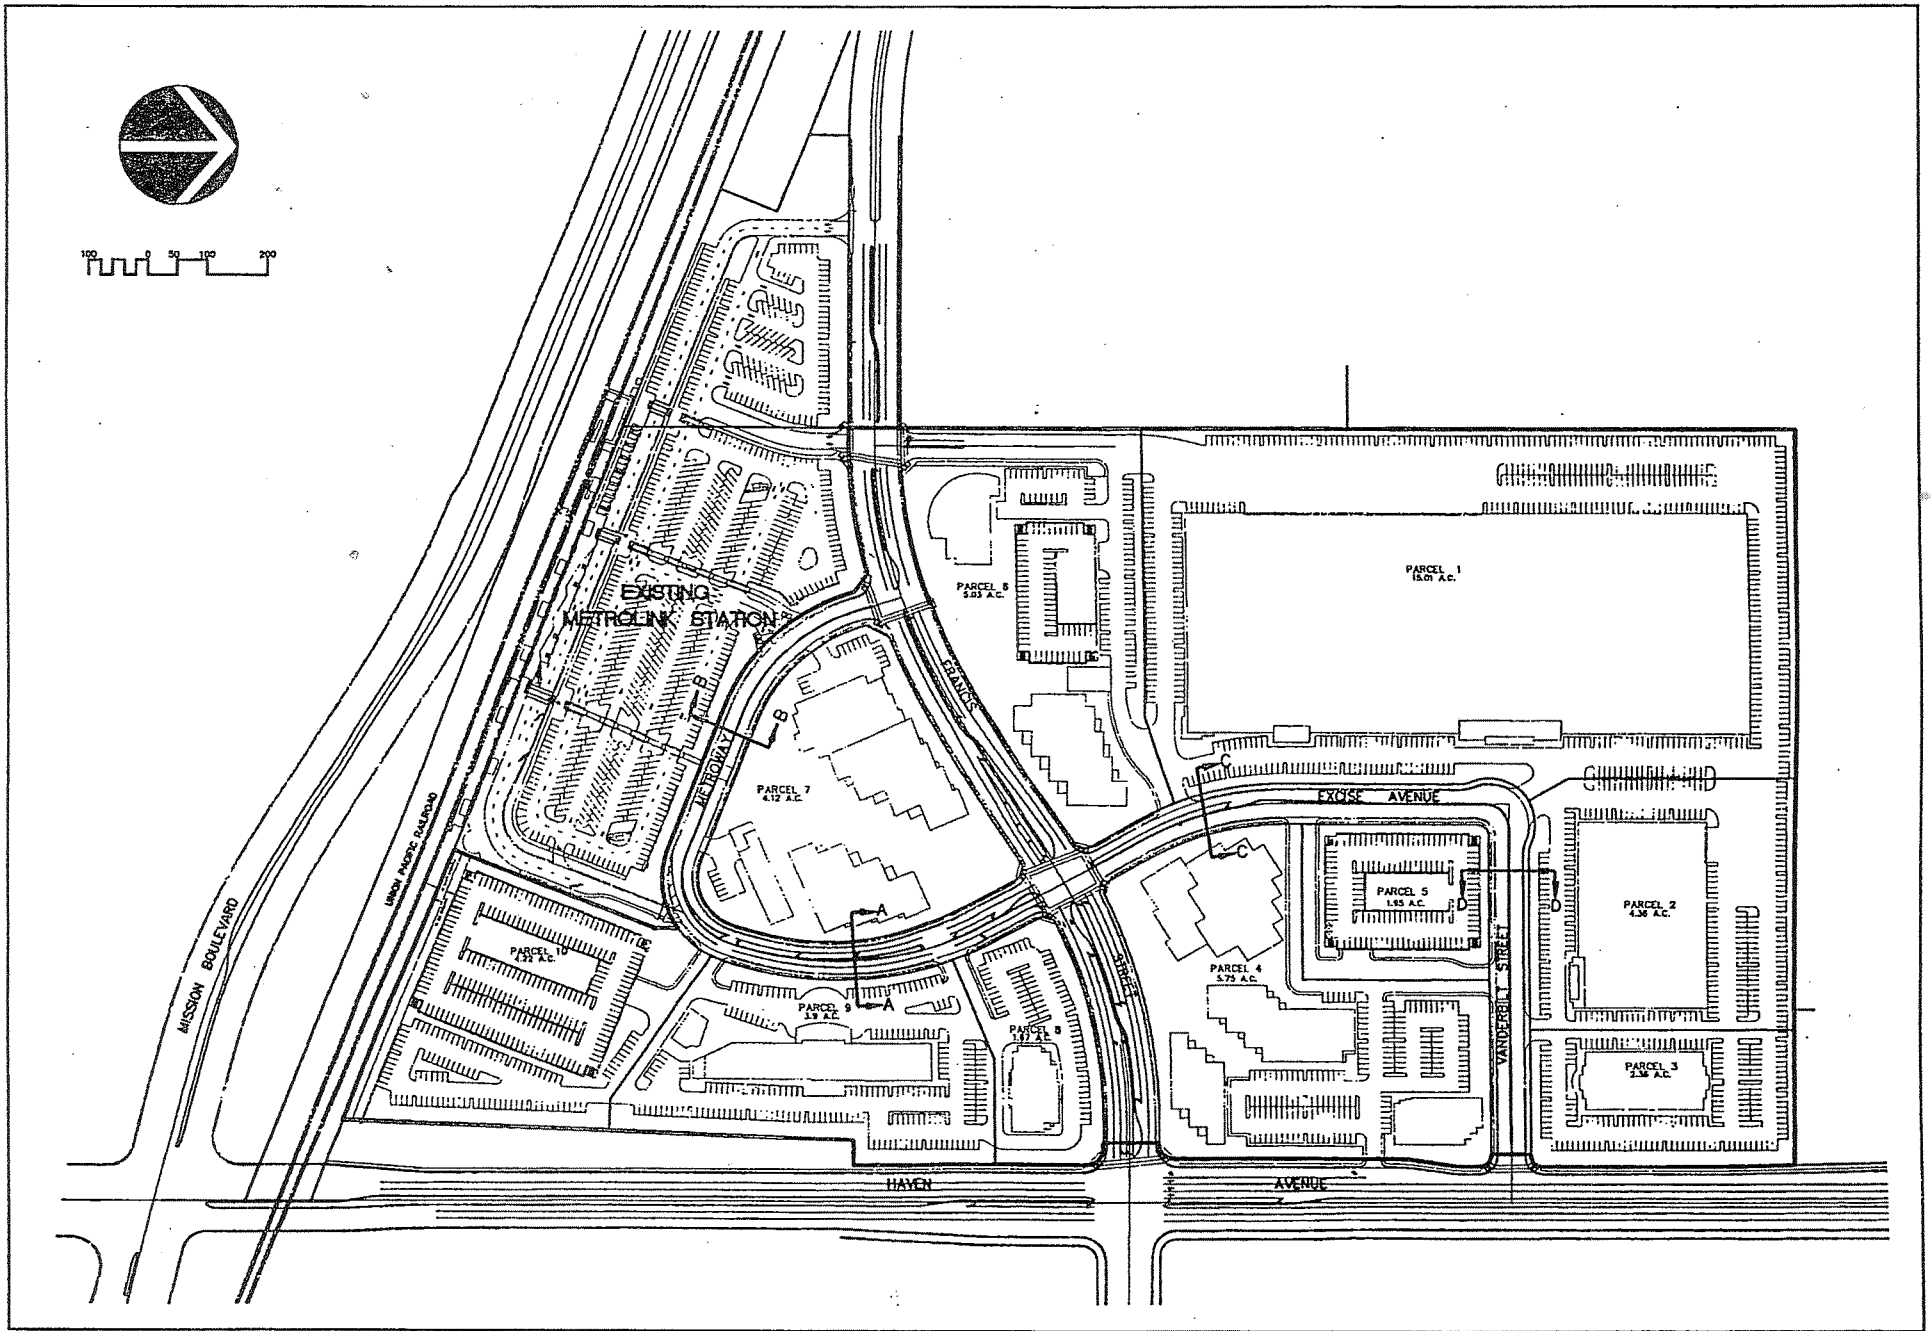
The Roadway Plan (note changes to plan, Preface, page iii)
